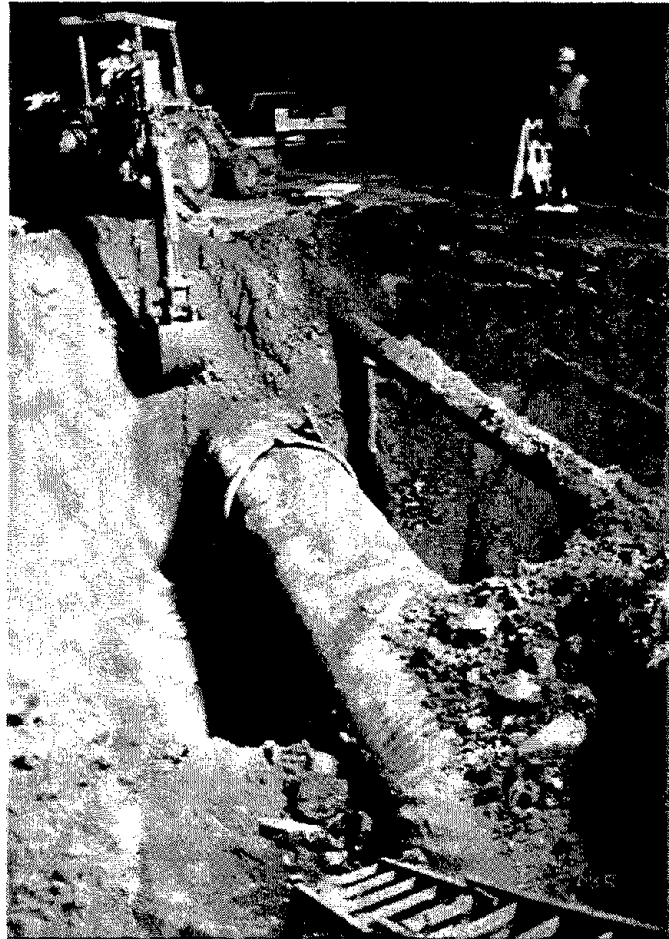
Balboa Blvd. at Halsey St. compression zone, back hoe uncovering compression damage 48-inch WS pipe. (LADWP)
